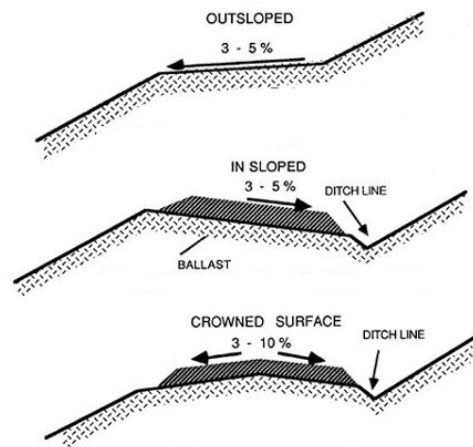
Road cross section shapes that enable drainage (FAO, 1998).
